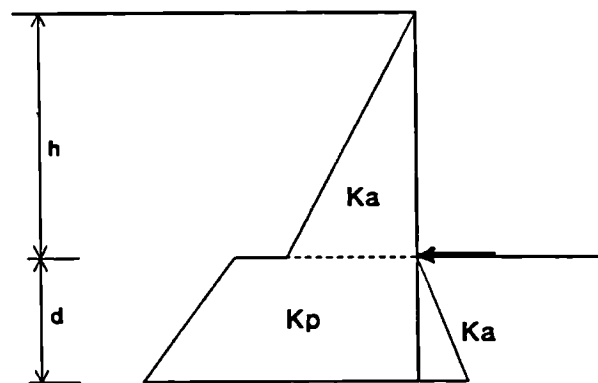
Limiting soil stress distribution for a wall propped at dredge level of shallow embedment
